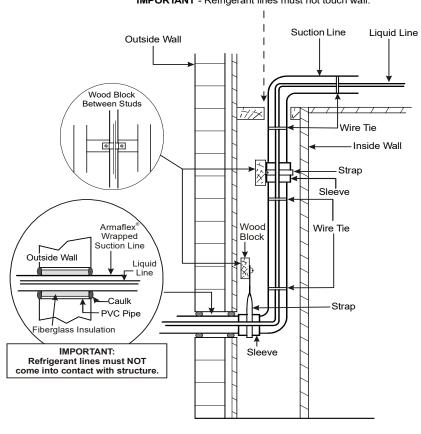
Installation of Refrigeration Piping (Vertical)
